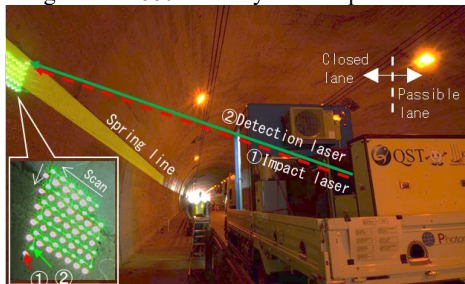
Laser hammering inspection under one-sided traffic restrictions in road tunnel⁴⁾
